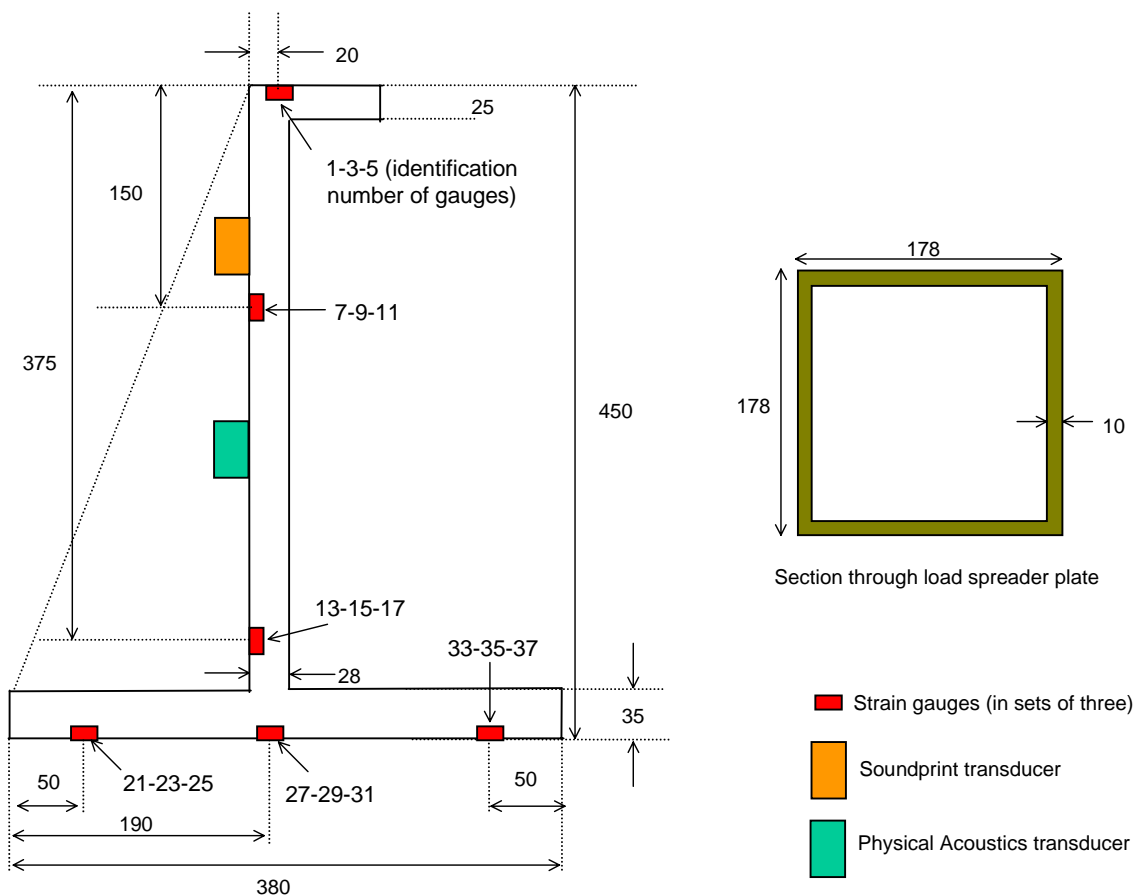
Cross section through beam at mid-span (showing location of strain gauges and lines of acoustic transducers) and through load spreader plate
